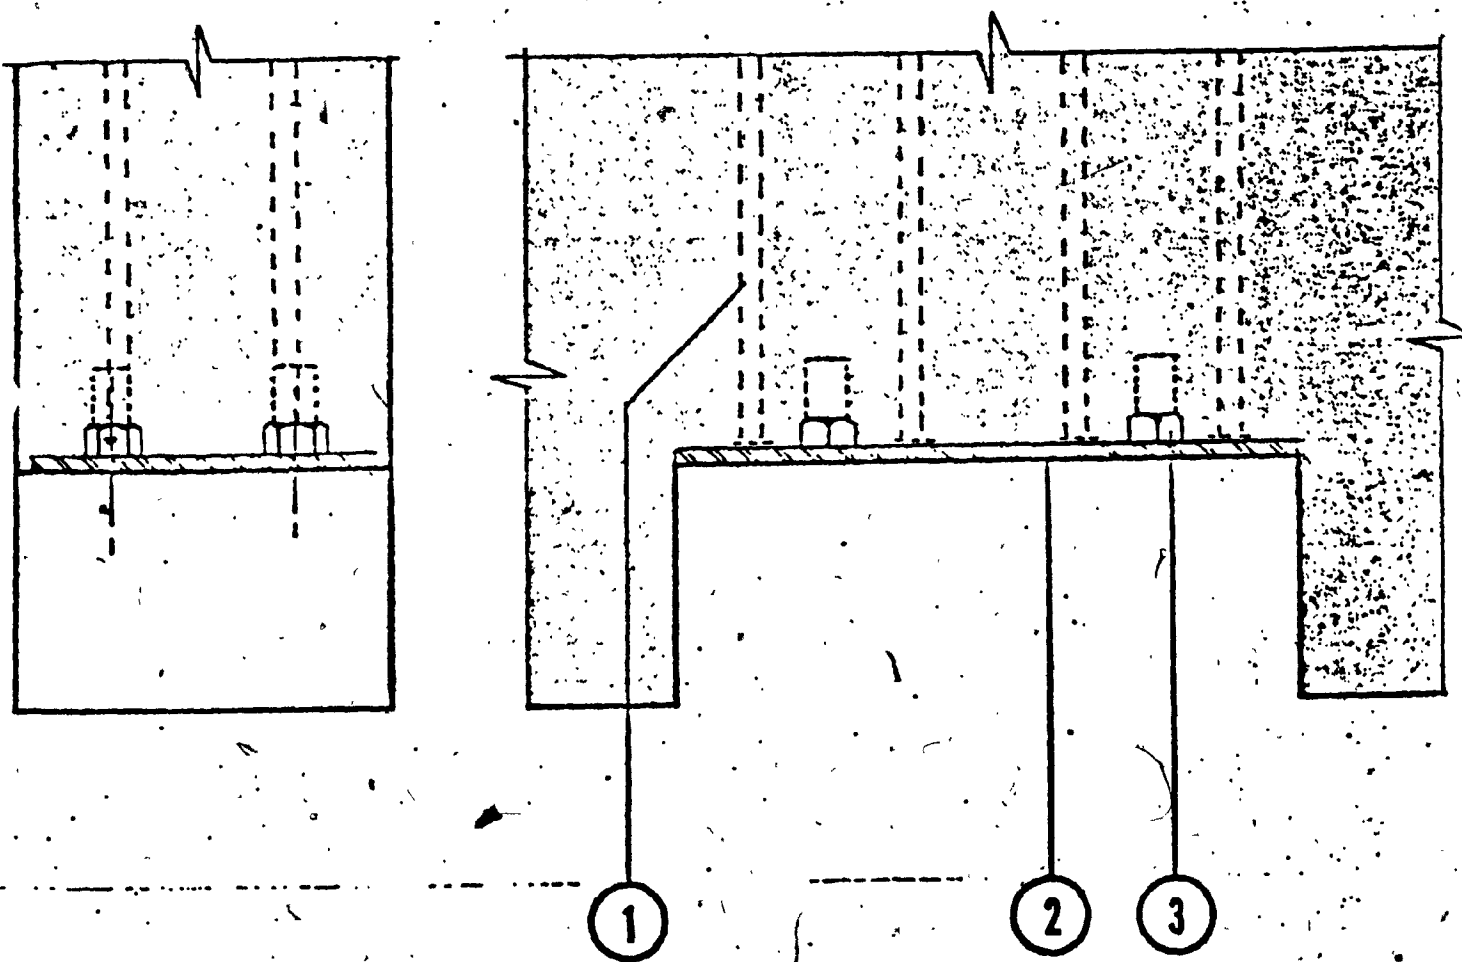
(b). Mechanical Bolted Connection Floor/Wall Connection R 21
